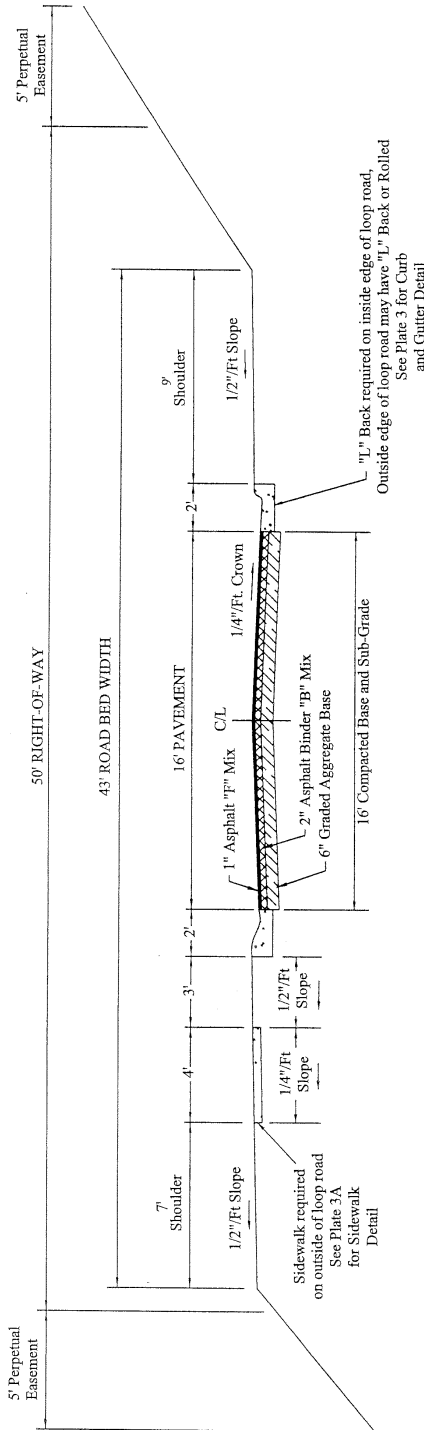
A: CONSTRUCTION REQUIREMENT CURB AND GUTTER WITH SIDEWALKS
